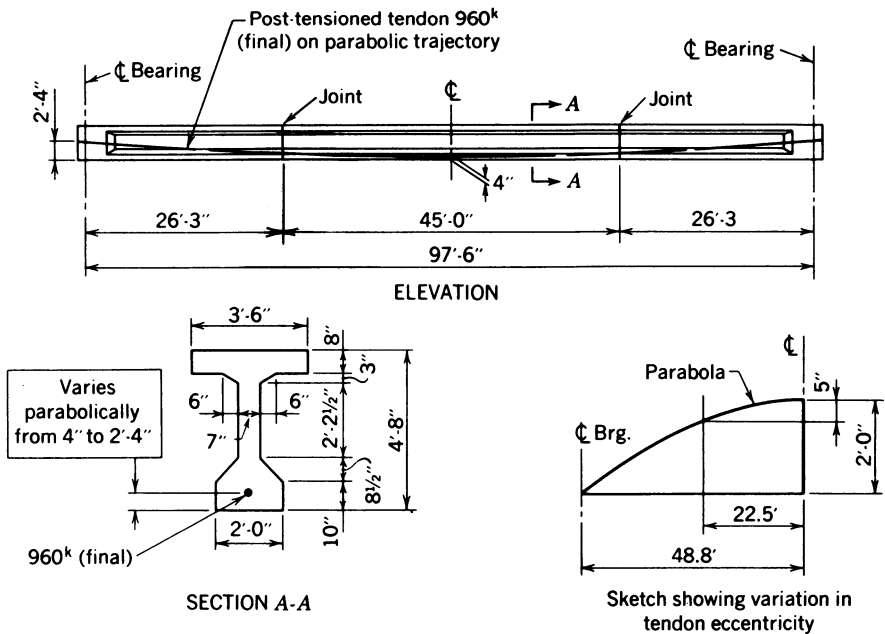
Segmental post-tensioned beam. Adapted from bridge over Naugatuck River, Route 68, Connecticut.
